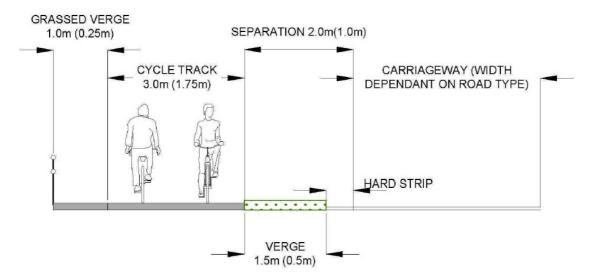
Off-road cycleway cross-section (NRA, 2014a)
